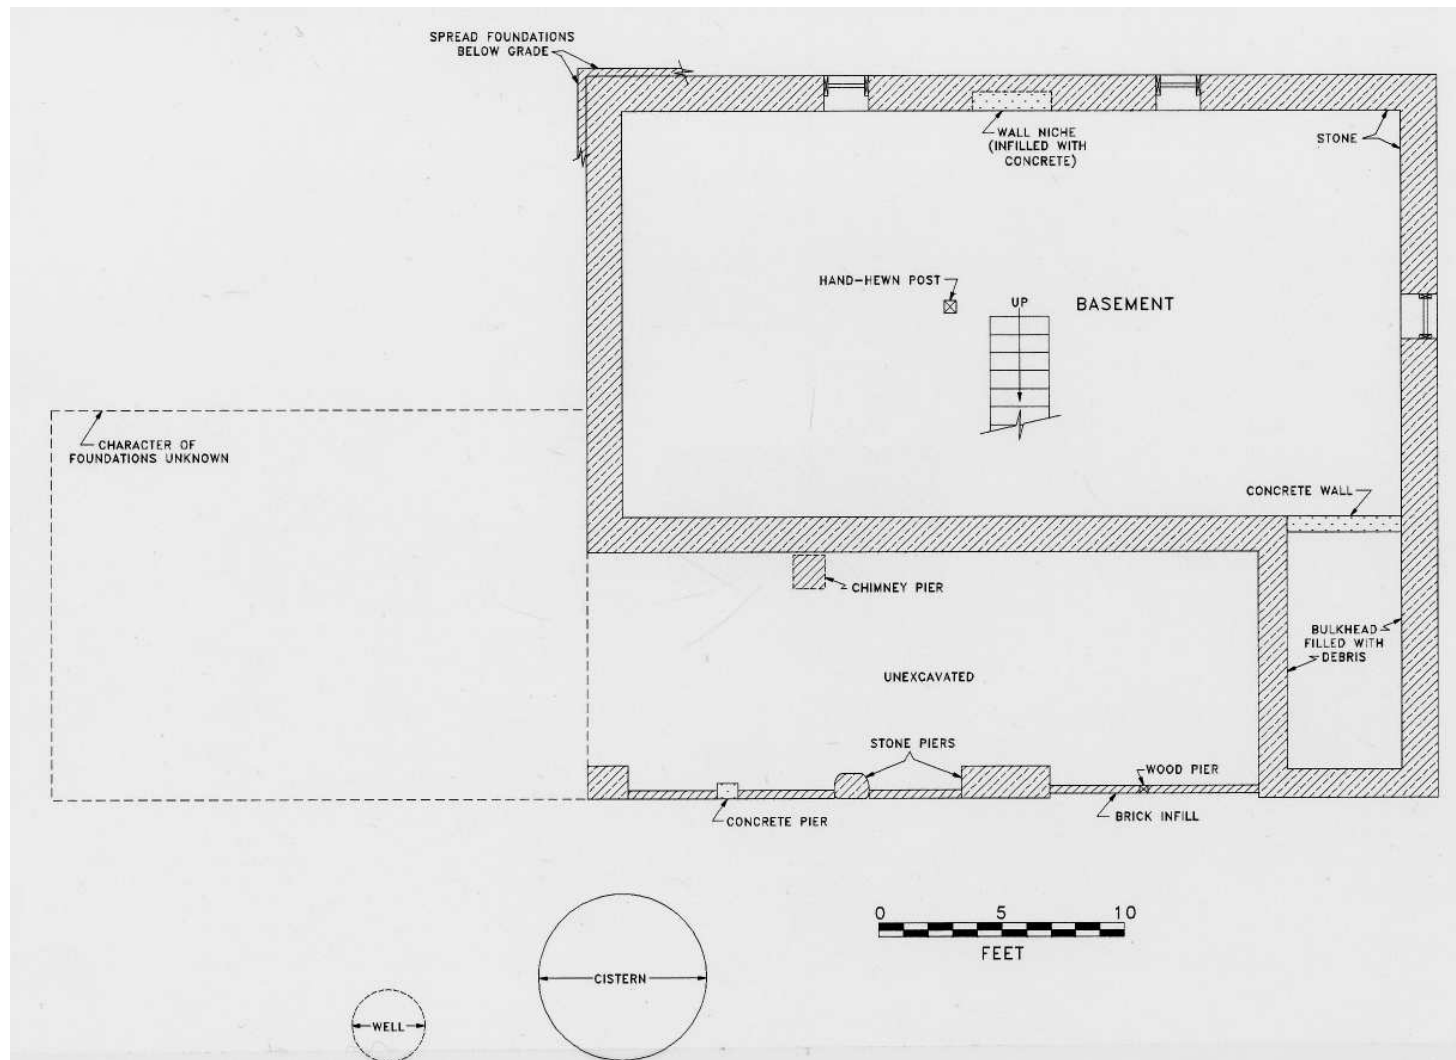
Basement and foundation plan of the Valentine House, illustrating present condition.
